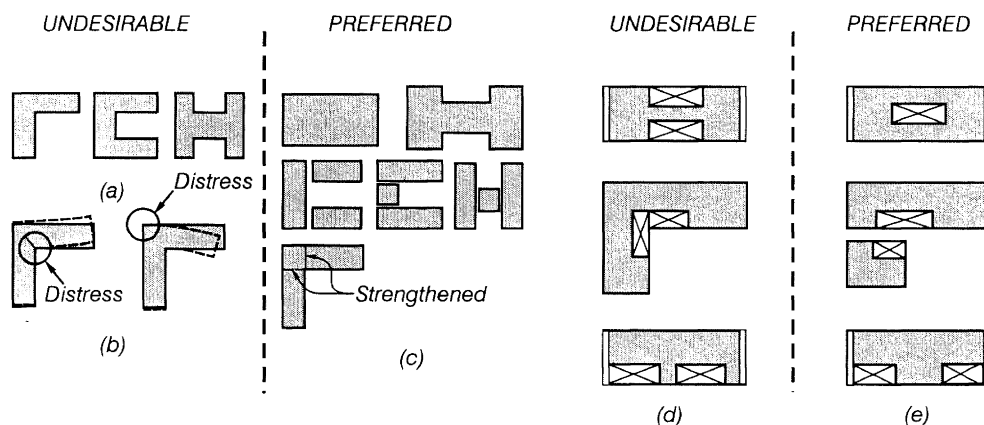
Plan Configurations in Buildings (Paulay et al, 1992)
